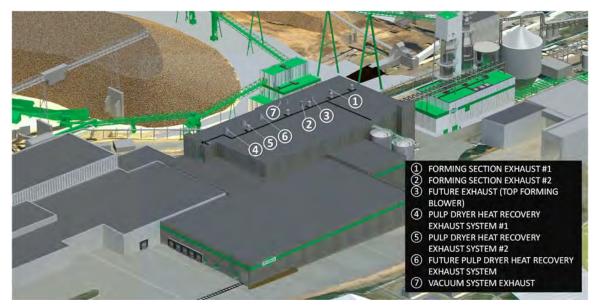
Three-dimensional model showing the exhaust points on the roof of the pulp dryer building proposed for the Reversing Falls Mill in Saint John, New Brunswick.
